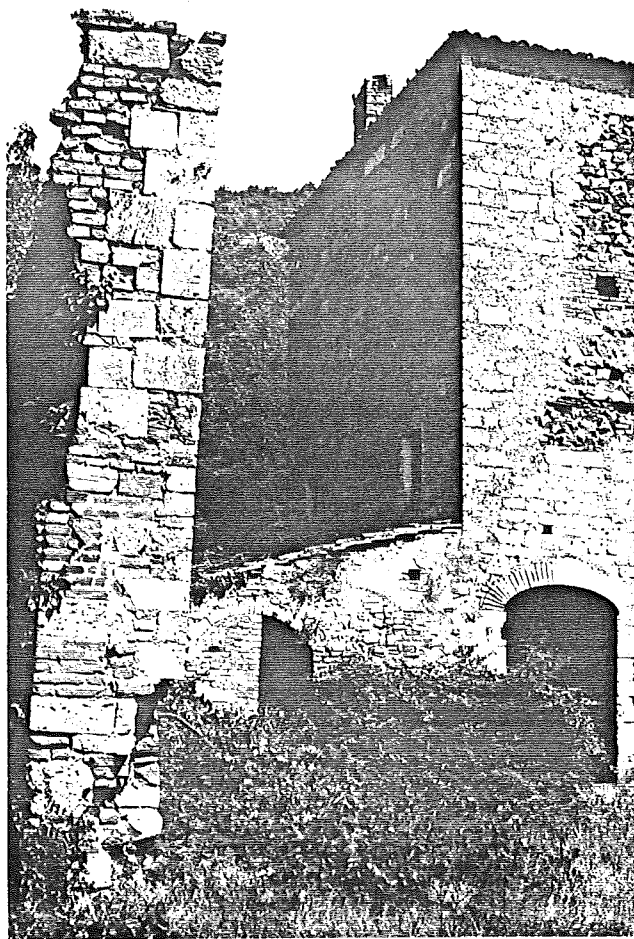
North facade of casa colonica plus attached shed roof structure and south corner remnant of adjoining, unidentified building to the northwest (Appendix C, BUILDING PLAN, Nos. 21 and 15, respectively).
